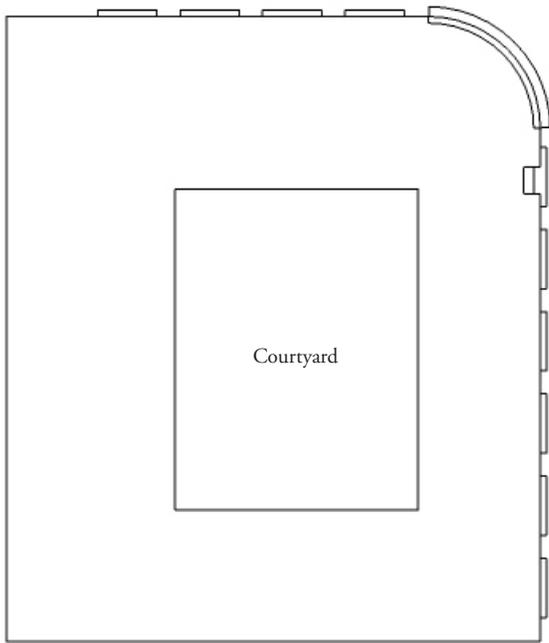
Typical Result from Connecting Floor Plate Exception
